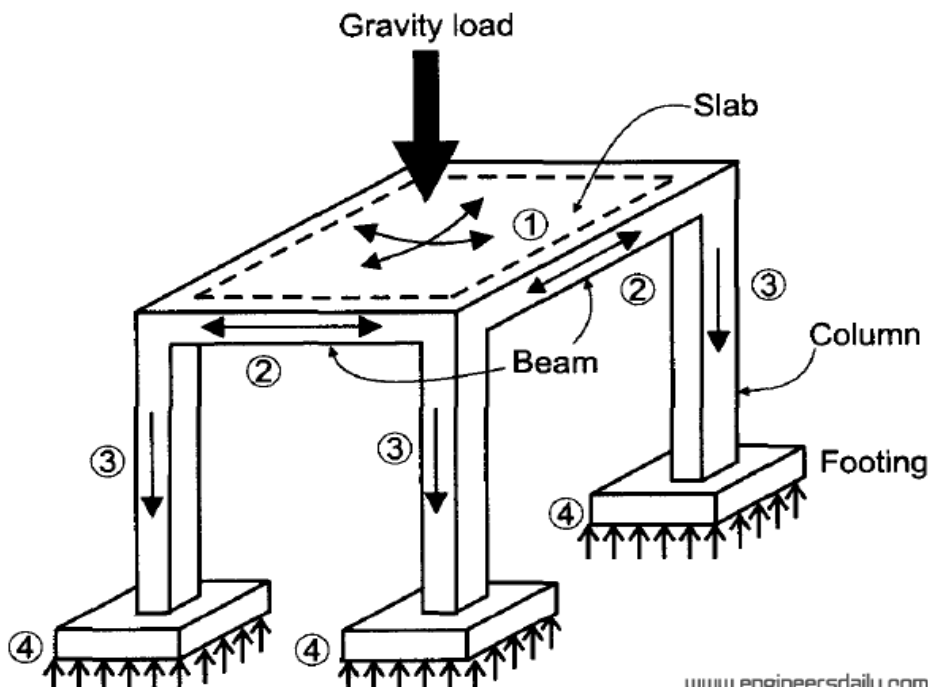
An isometric view of a concrete structure showing a gravity load path.
